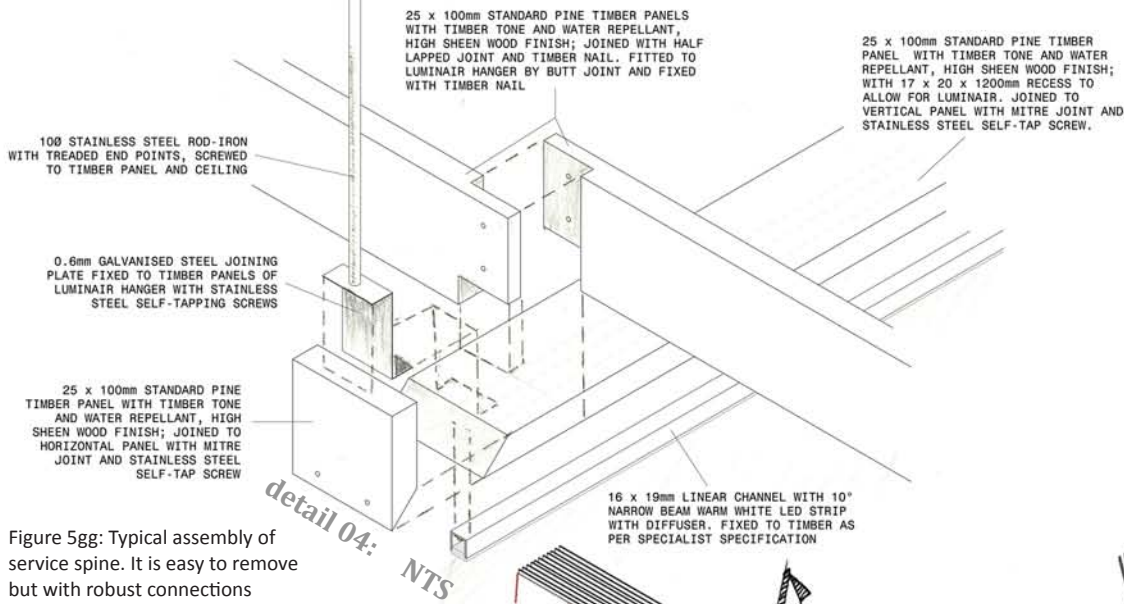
g: Typical assembly of service spine. It is easy to remove but with robust connections
